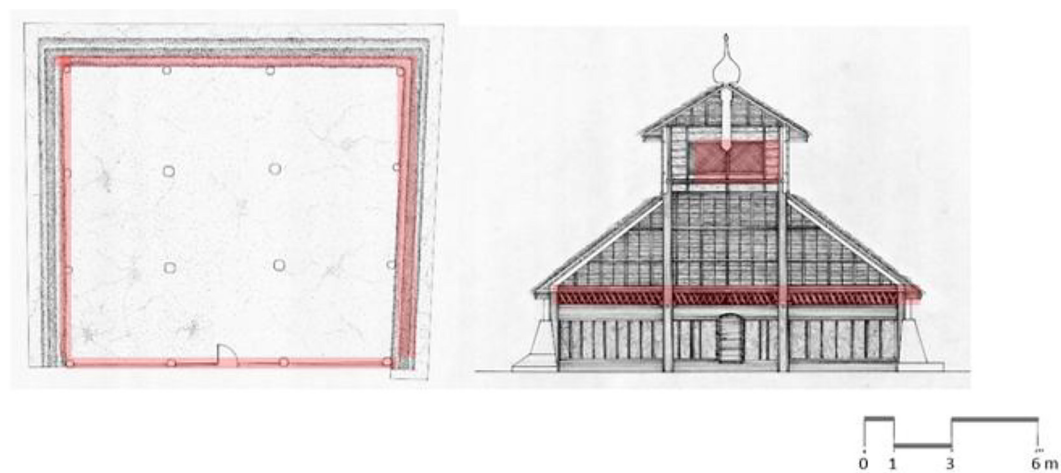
(M1) Asal Penampaan mosque (floor plan, vertical section, and ventilation shown in pink)
